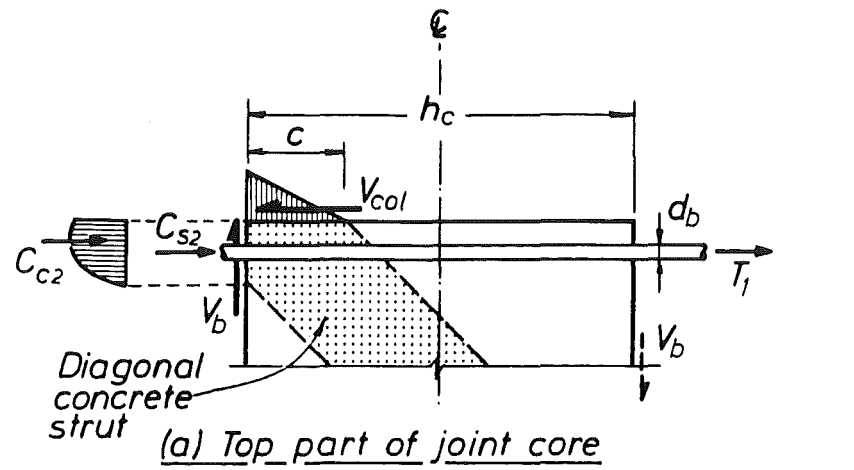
Assumed actions in an inelastic interior joint with perfect anchorage of beam bars
